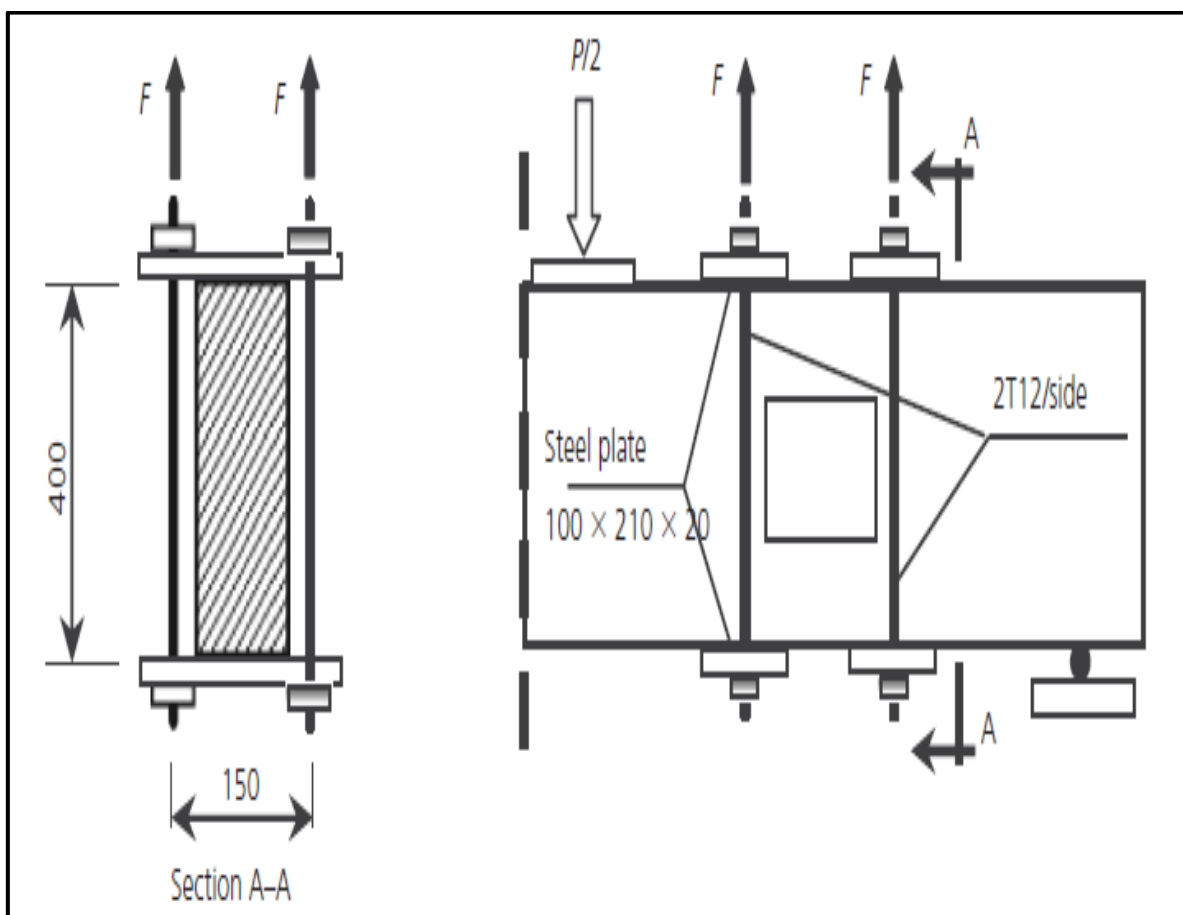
4: External prestressing bars location detail used by Atta and Khalil, (2014) (all dimensions in mm)
